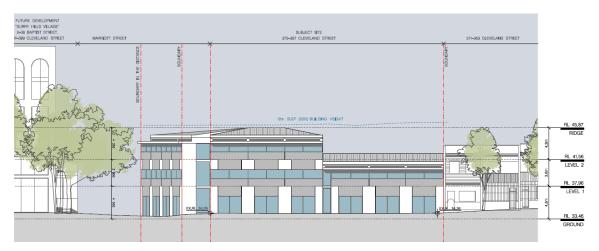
Pre-DA Scheme 1 - Cleveland Street Elevation
